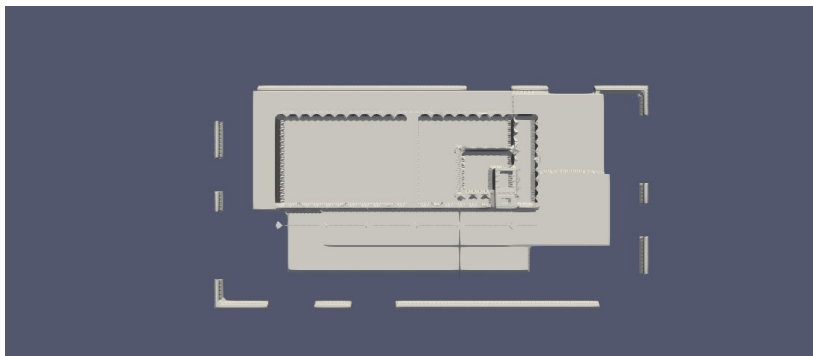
Extracted building envelope of the BIMcollab_ARC model
